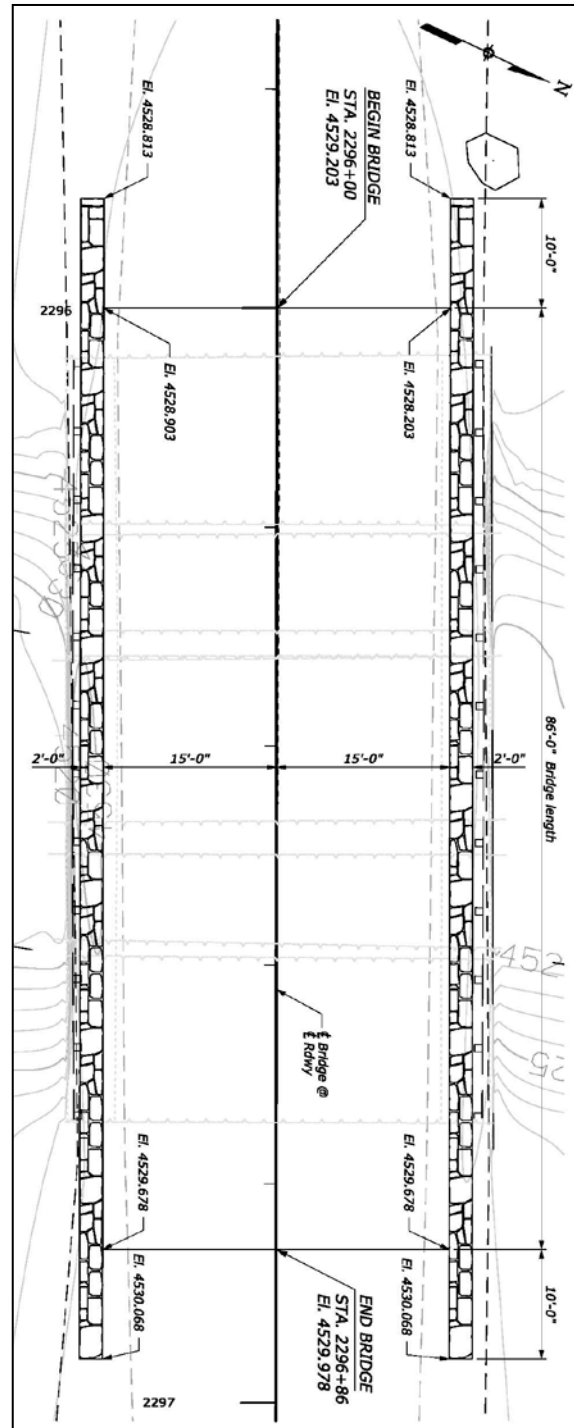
Preliminary design layout for the new Rose Creek Bridge; grade diagram.
